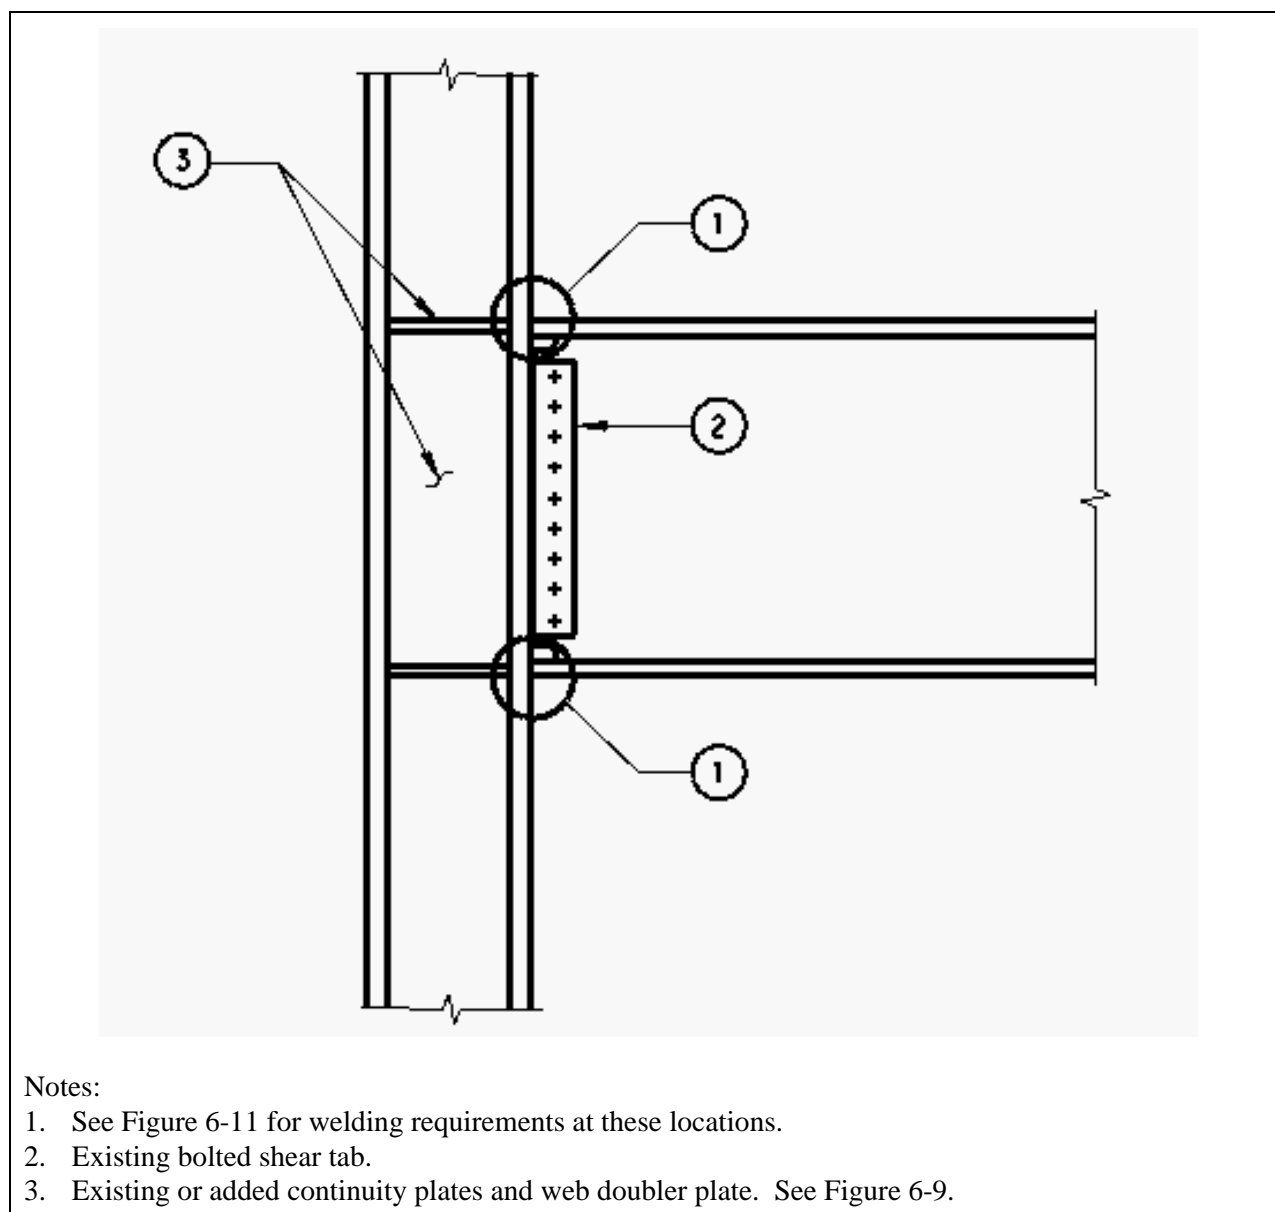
Improved Welded Unreinforced Flange Connection
